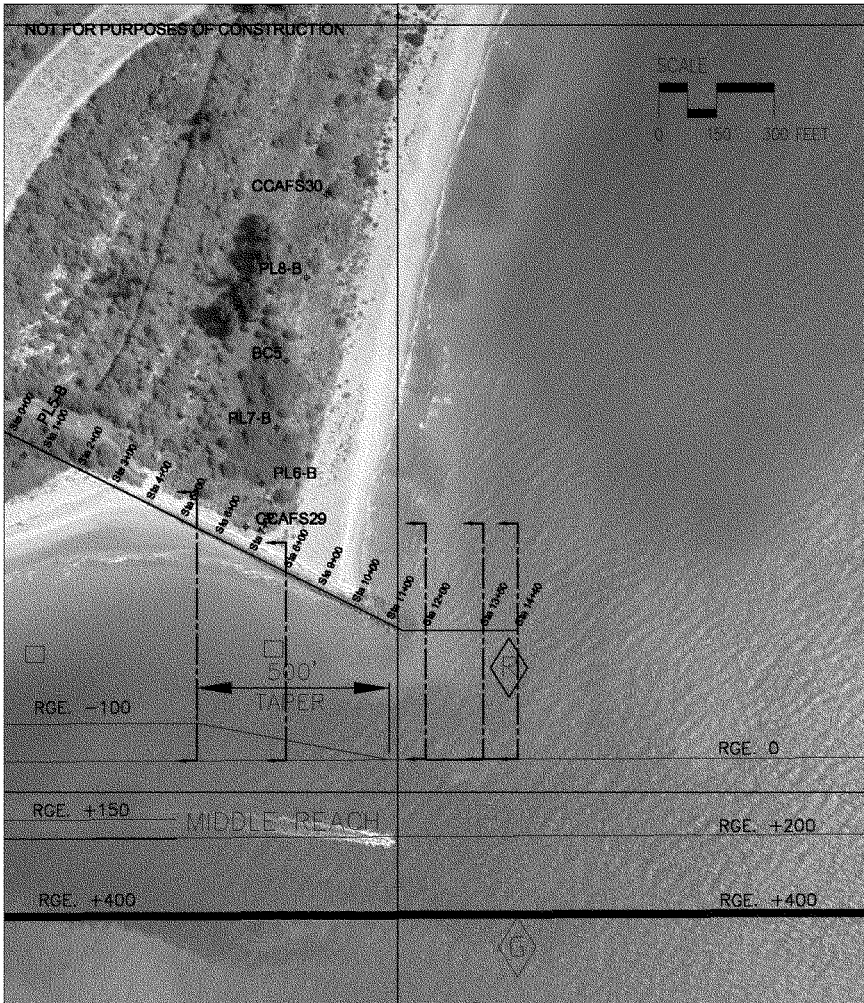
Proposed north jetty widener (preferred alternative) and location of sectional views in relation to USACE construction stationing along the north jetty.
